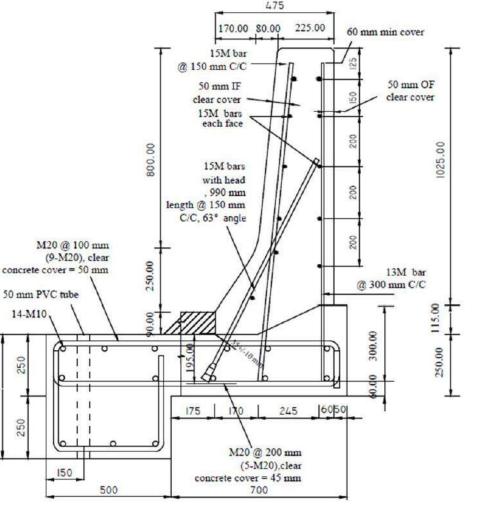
Barrier specimen B-3 details (Interior Location - With Cantilever)
